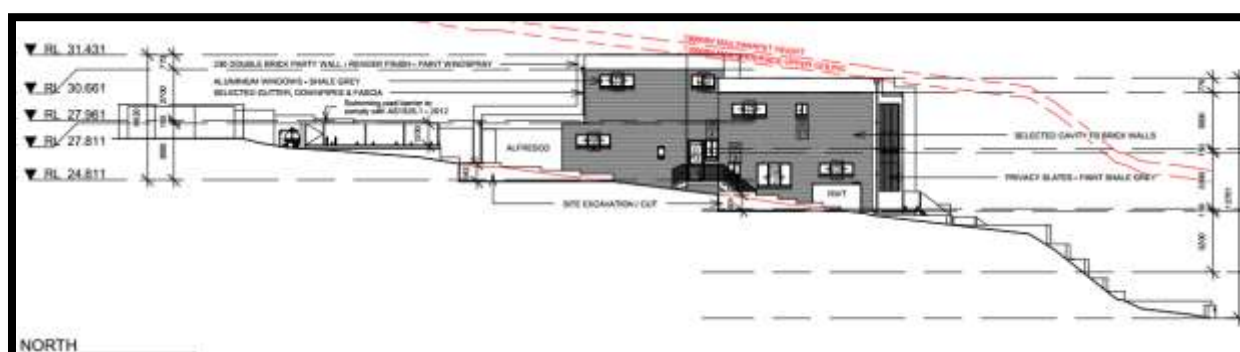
North (side) Elevation at 68 Morshead Drive Connells Point (Source – AUSDAC)
